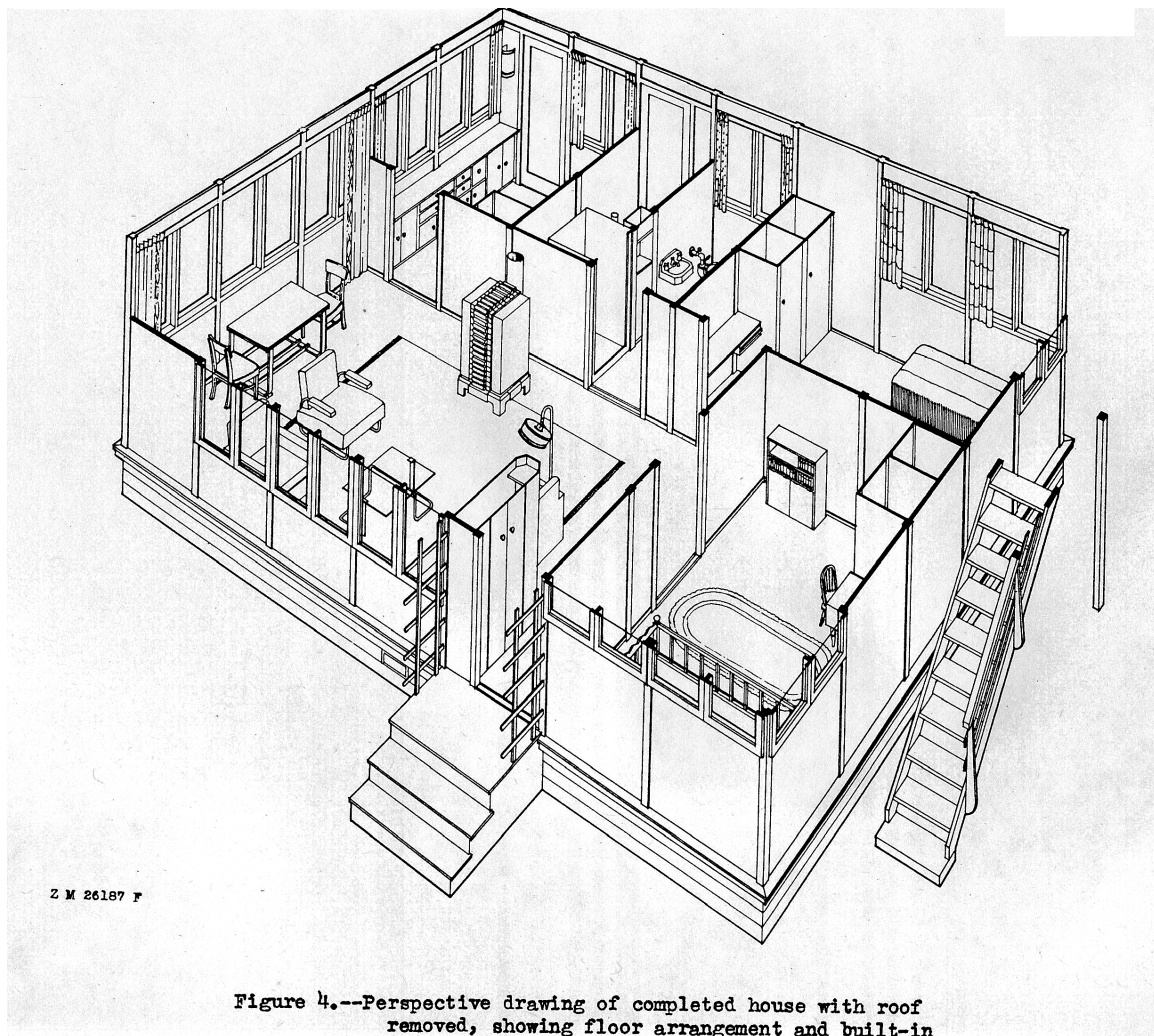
Perspective drawing of completed house with roof removed, showing floor arrangement and built-in
